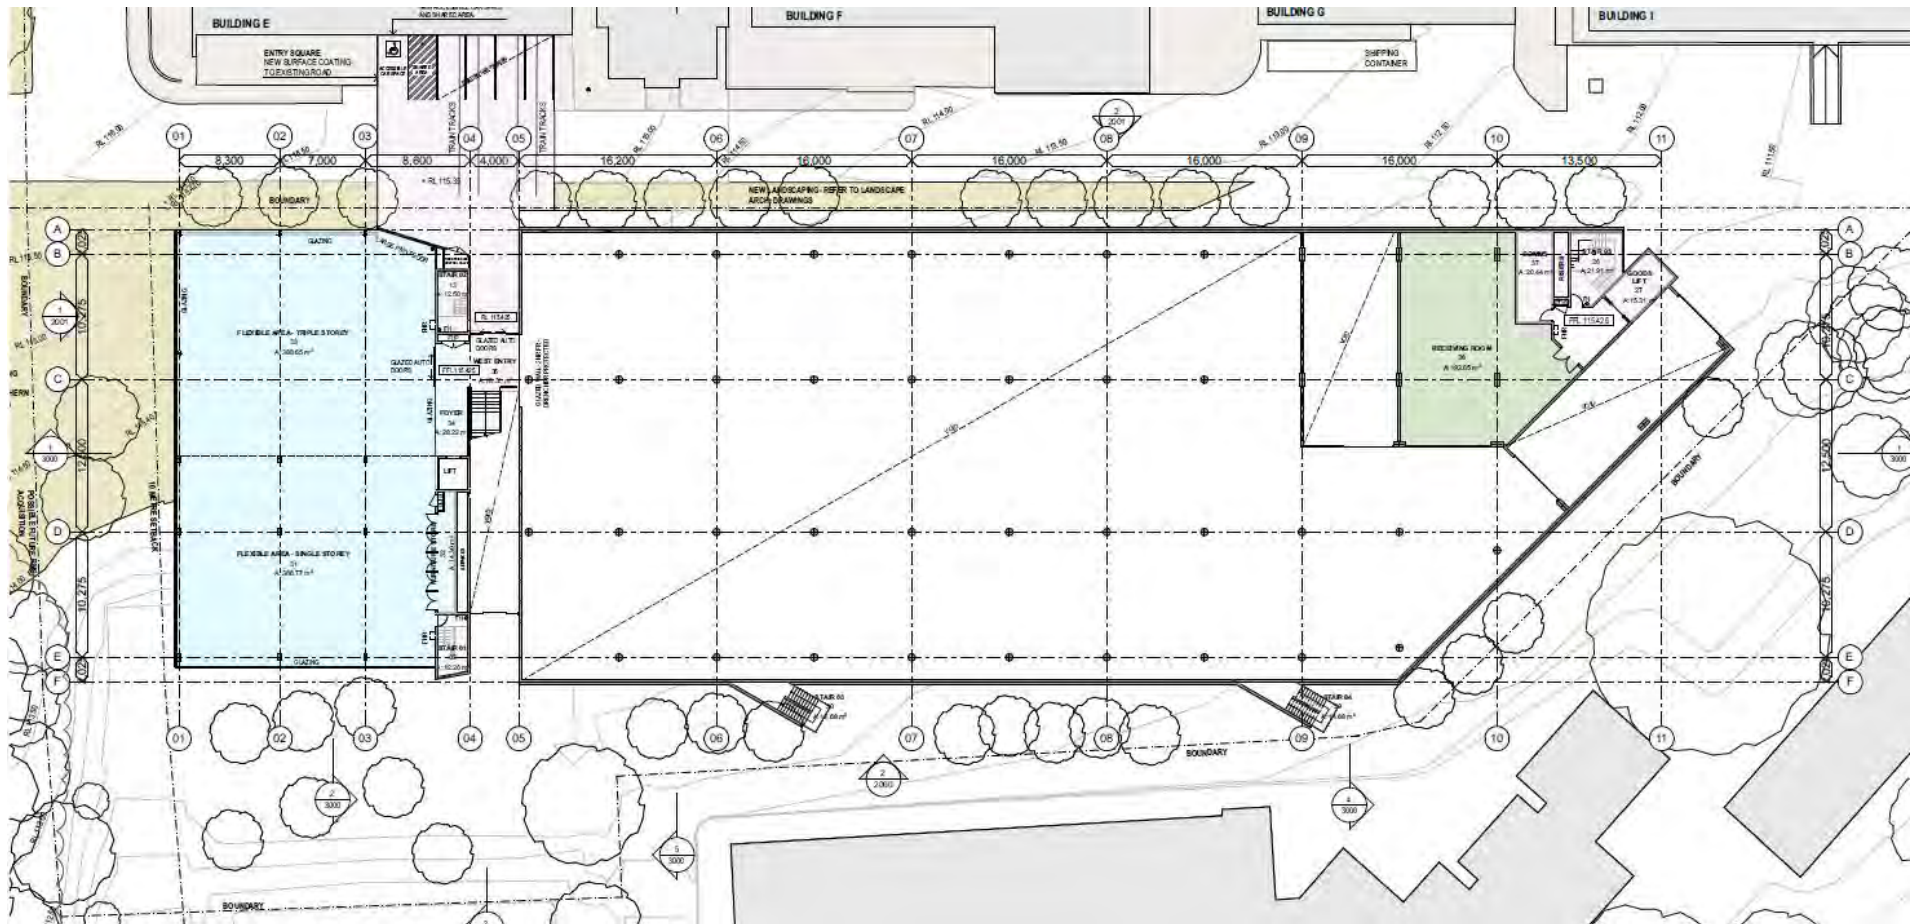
Ground Level Plan (Lahnimmo Architects, DA1401, Rev.12, 7.08.2020)
